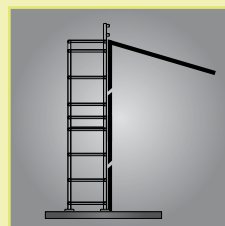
(g) Inside standards supporting guardrailing adjacent to a roof structure that slopes away from the top edge.
